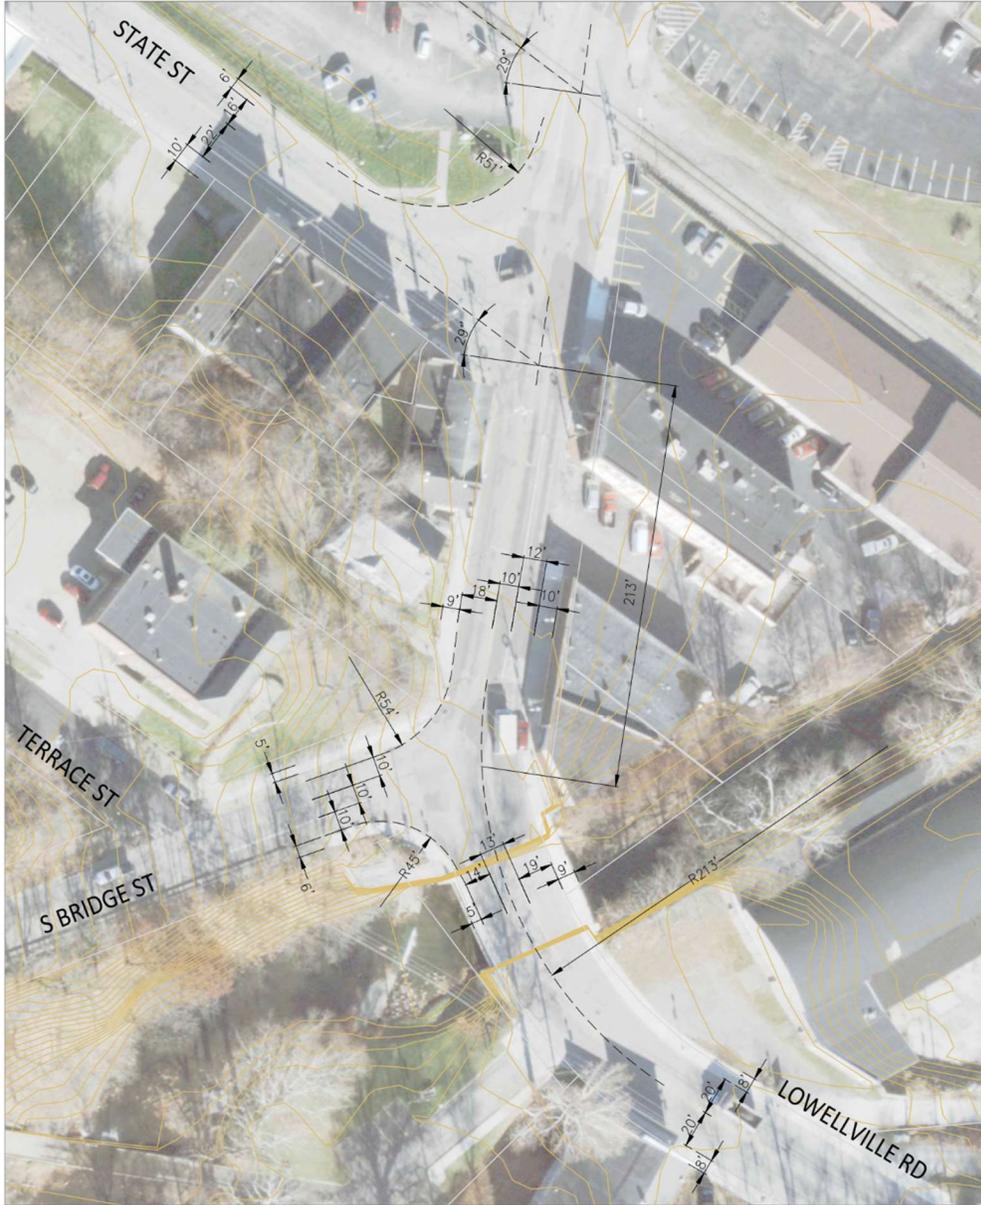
Facility dimensions, the southern portion of South Bridge Street.
